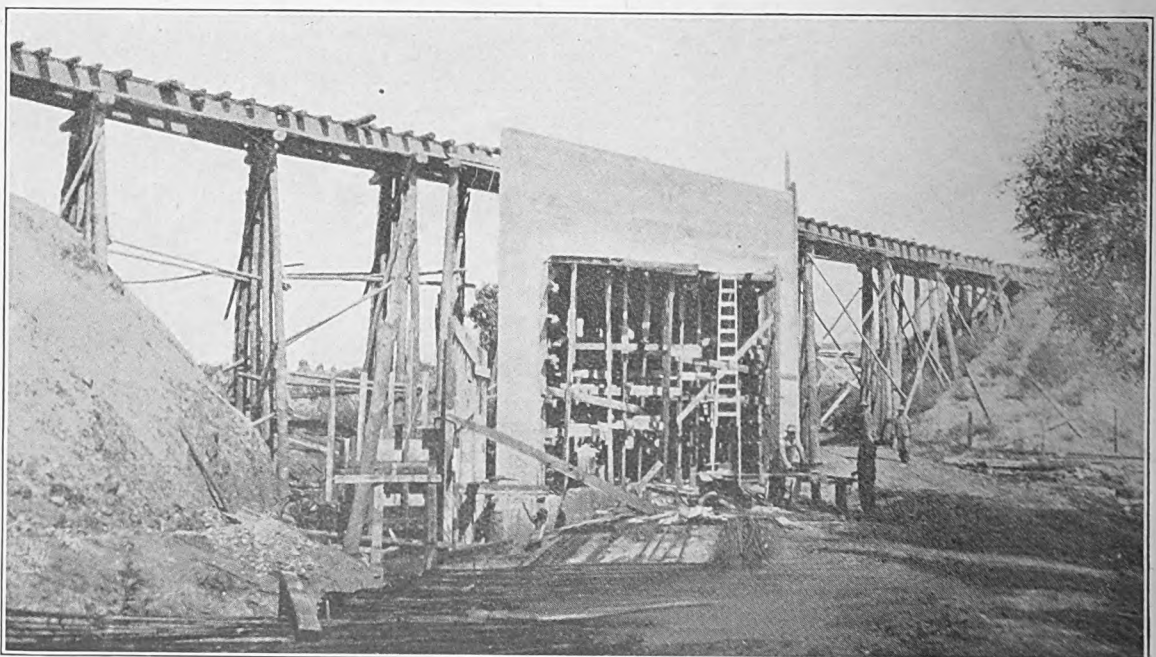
Standard 20x16-ft. Highway Under Crossing.
